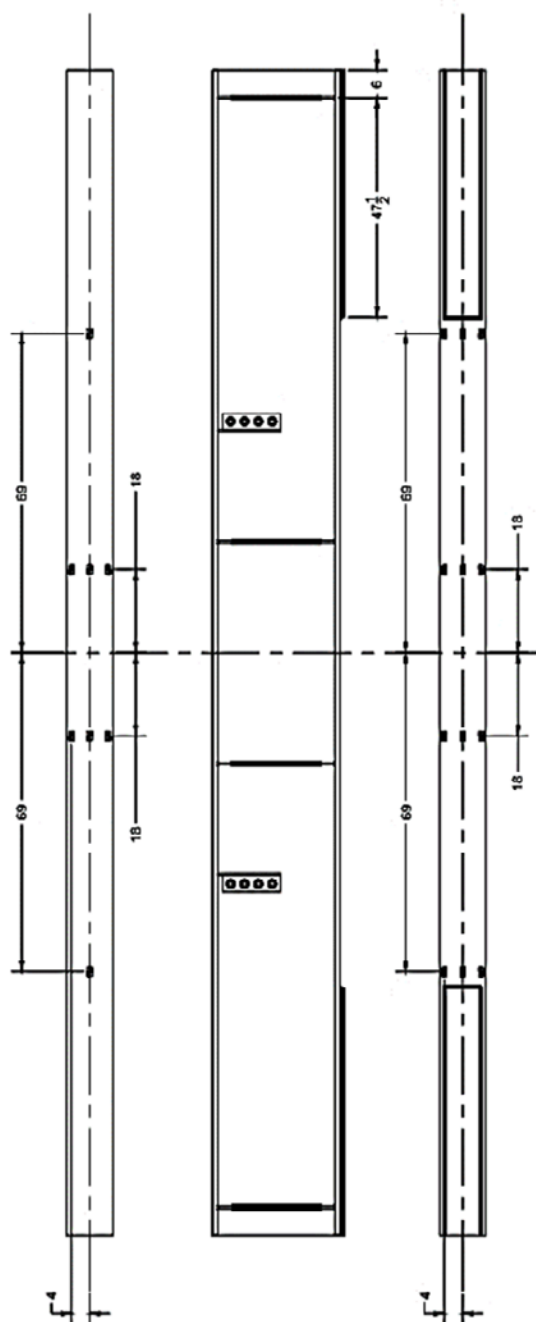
Specimen 1 – 6 Strain Gage Layout
